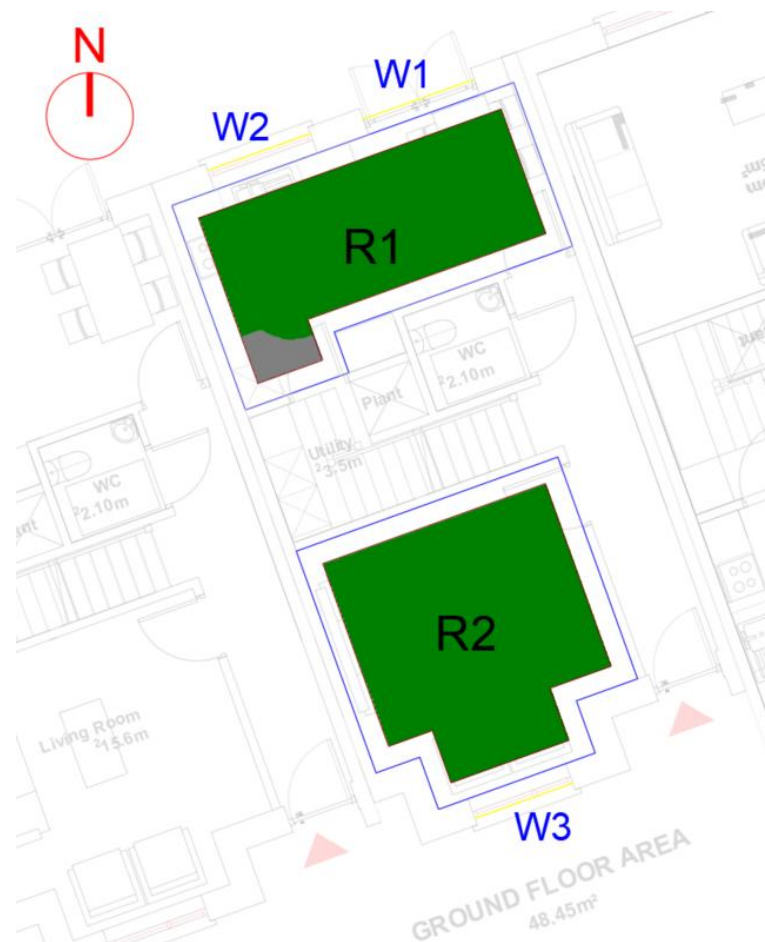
Proposed Ground Floor sDA Contours of House E-03 3-059
